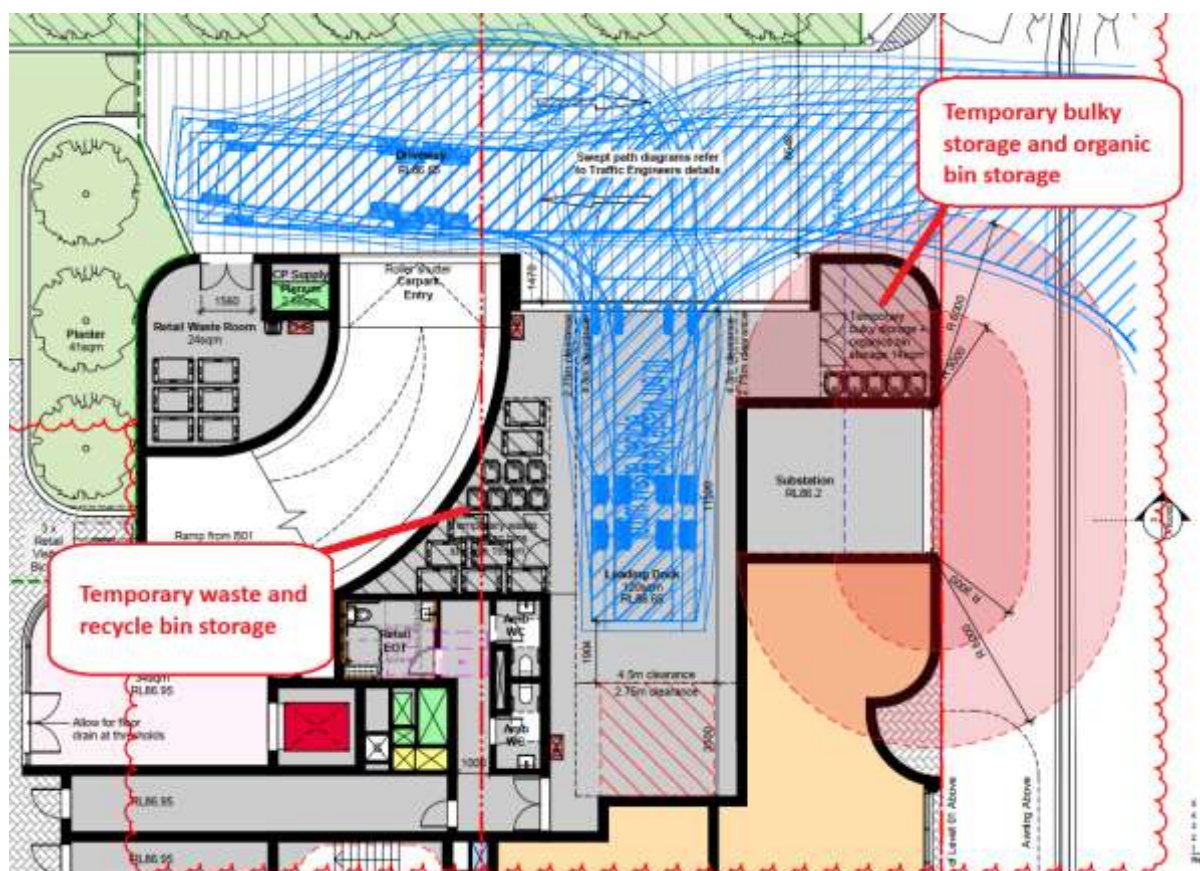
Extract of the Ground Floor General Arrangement Plan depicting the amended waste storage areas.
